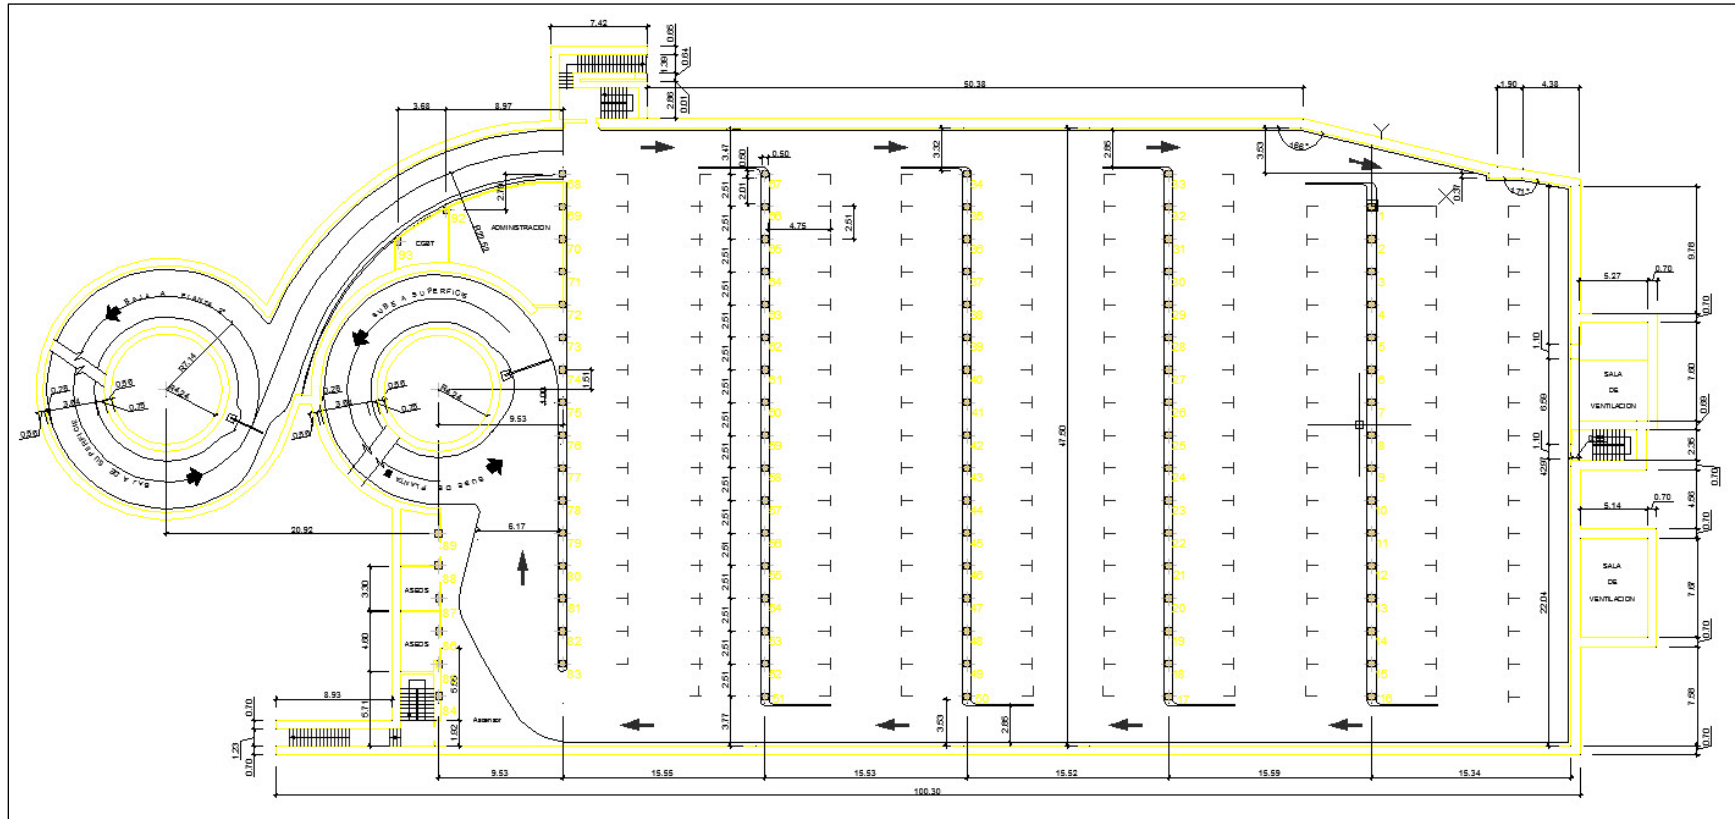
The structural plans of the old underground parking structure of the Plaza de la Reina.
